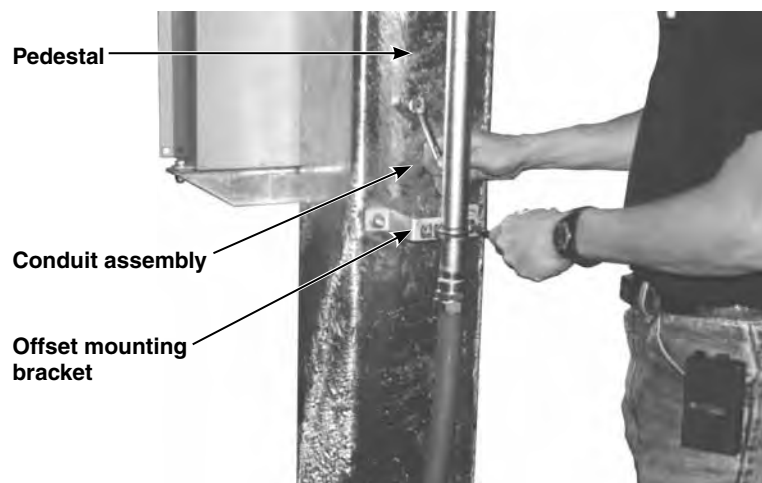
Using the offset mounting brackets, attach the conduit assembly to the pedestal.
